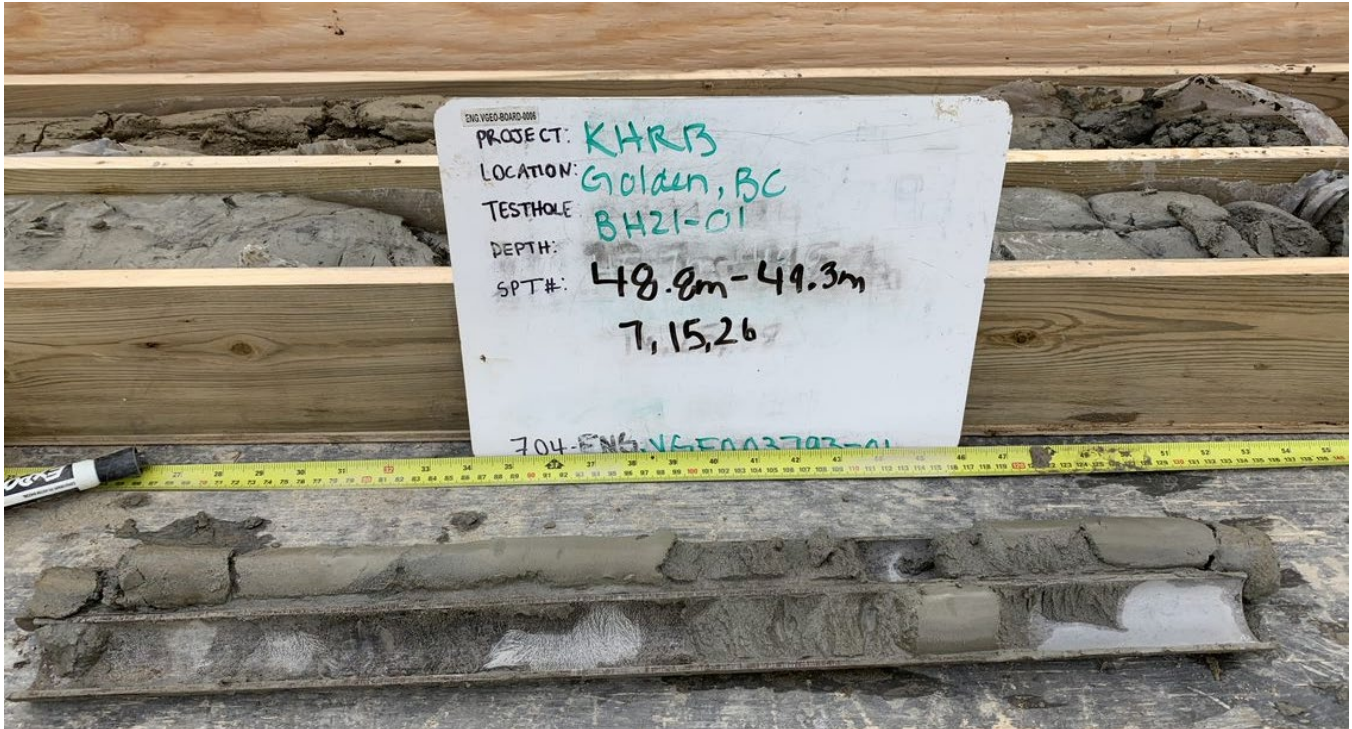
BH21-01, SPT-20, 48.8 m to 49.3 m
